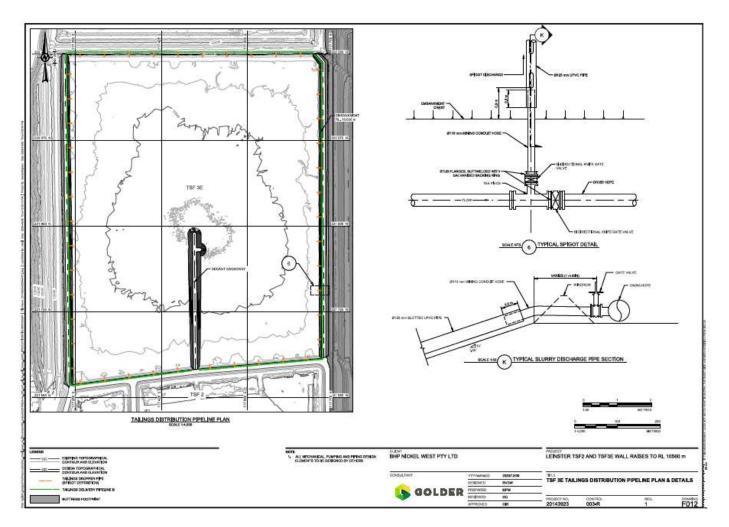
TSF3 Cell E Tailings Distribution pipeline plan and spigot design
